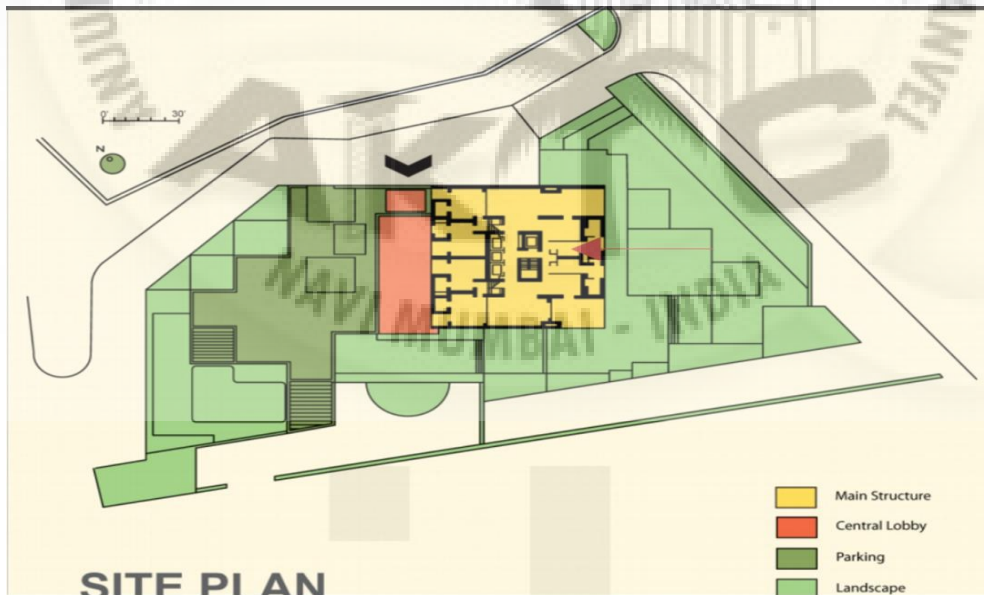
Site Plan Kanchenjunga Apartment (Source- architectopedia)
